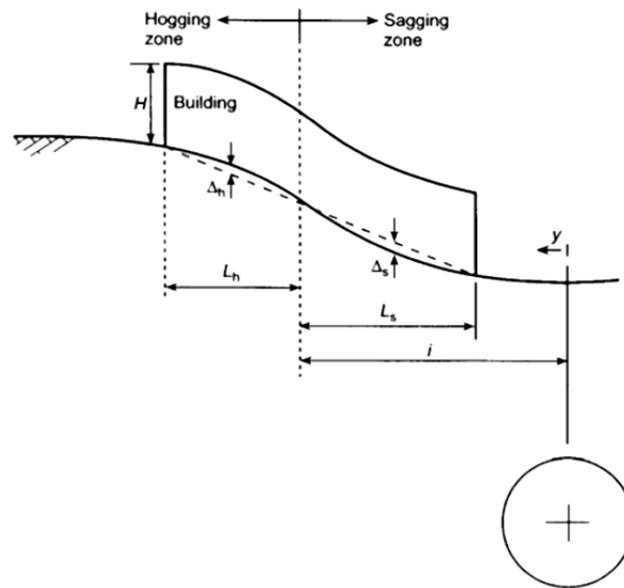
Building Length and Maximum Deflection in Hogging and Sagging Zones (Mair et al., 1996)
